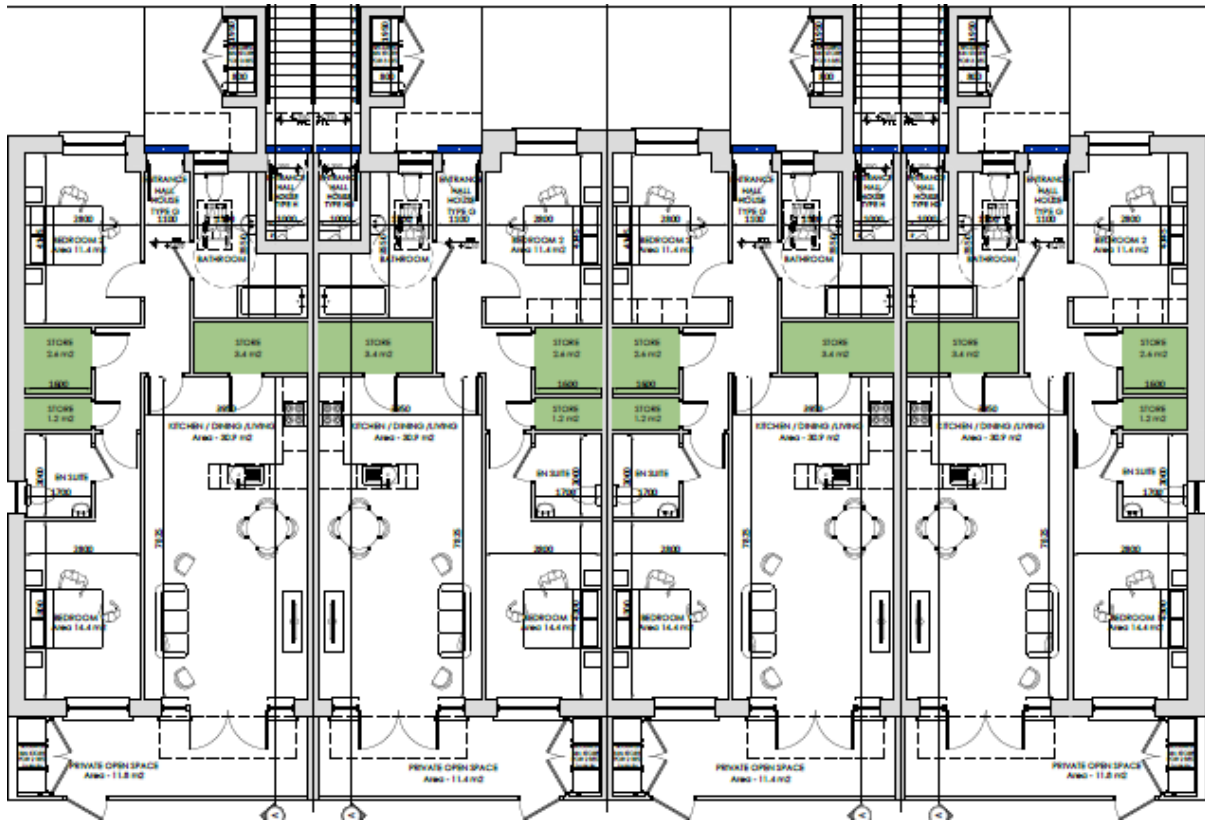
Proposed second floor plan of Duplex Apartment Block J.
